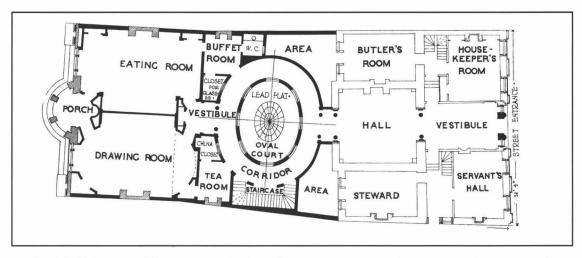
Robert Adam, ground-floor plan of Mrs Fitzherbert's house, 1787. (Source: Arthur Bolton, *The Architecture of Robert and James Adam* (1922).) The Adam addition is shown in dark outline.
